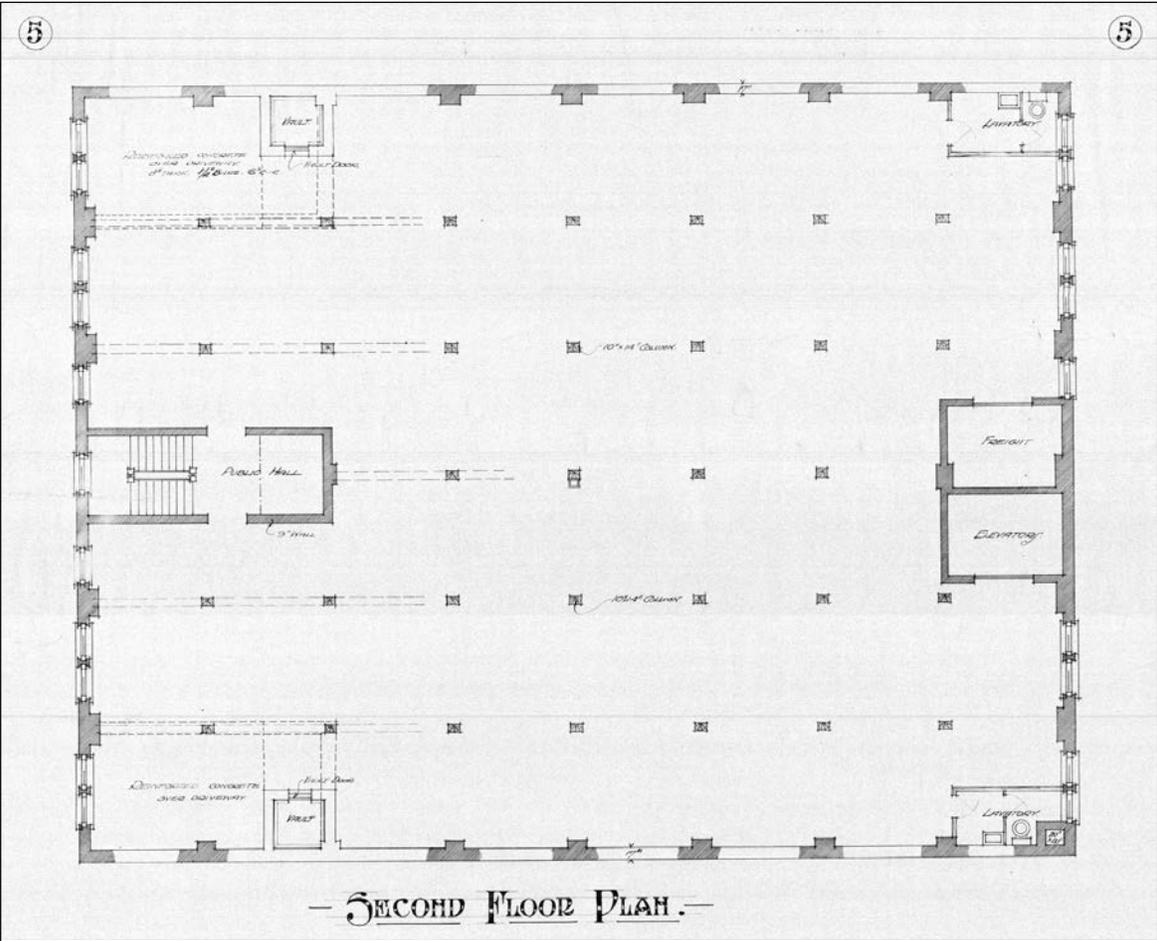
Architect’s plans, #3482/1912, “Second Floor Plan.” (Courtesy of the City of Winnipeg Archives.)
